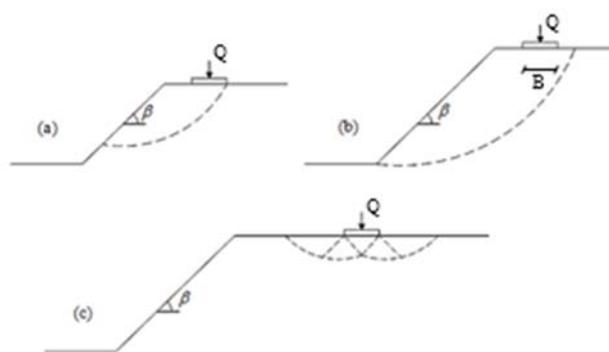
Different typical failure modes for footing-on-slope problem: bearing capacity failure (a, c) and overall slope failure (b).
